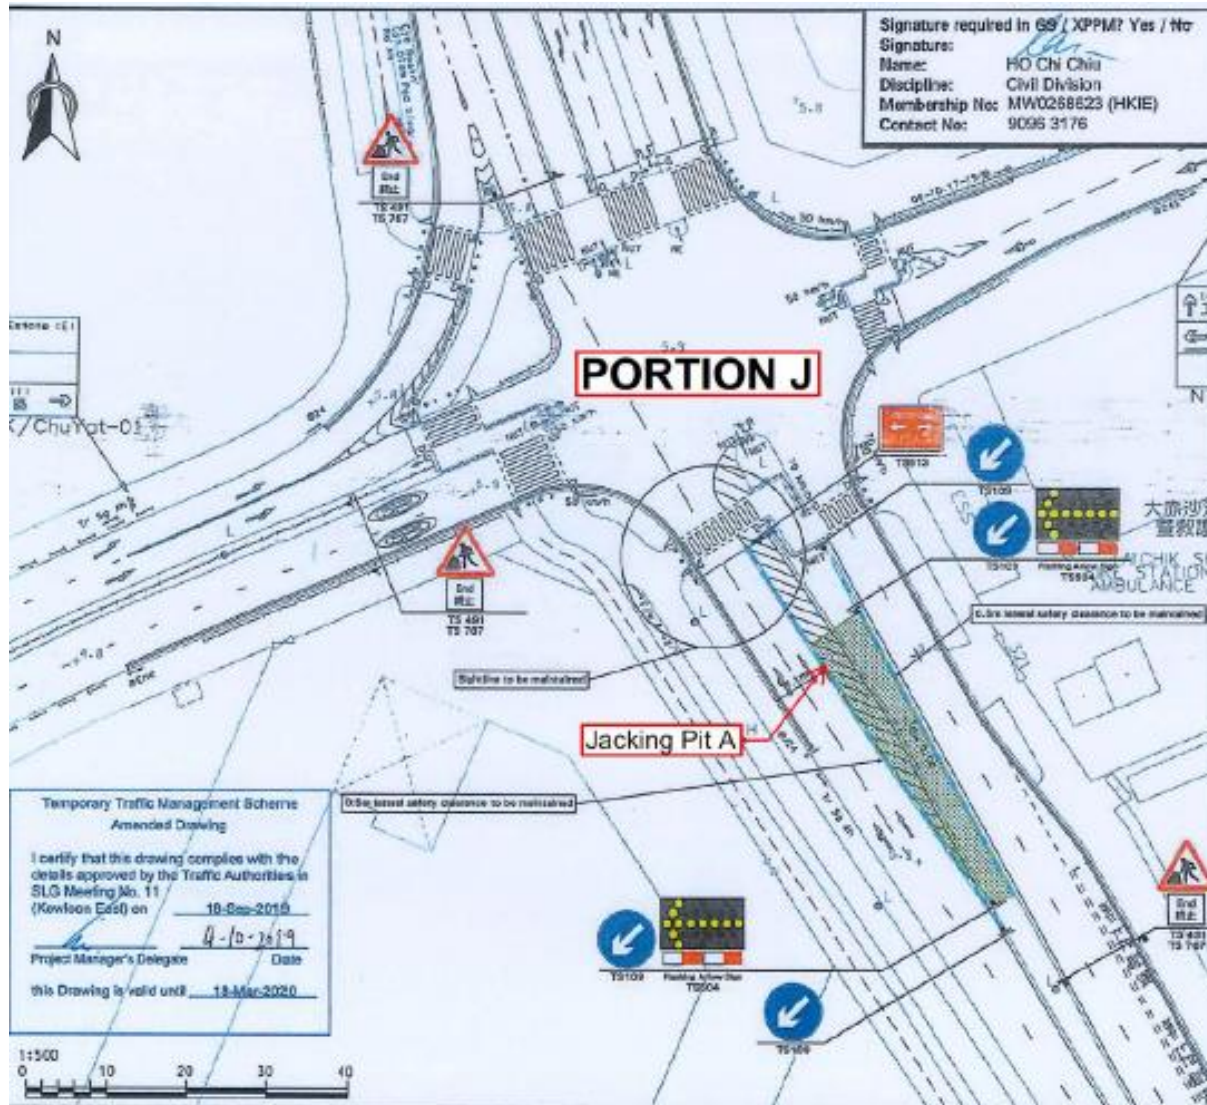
Location Plan for Portion J – CH. A13+50 to CH.A 14+00 (Pit A)
